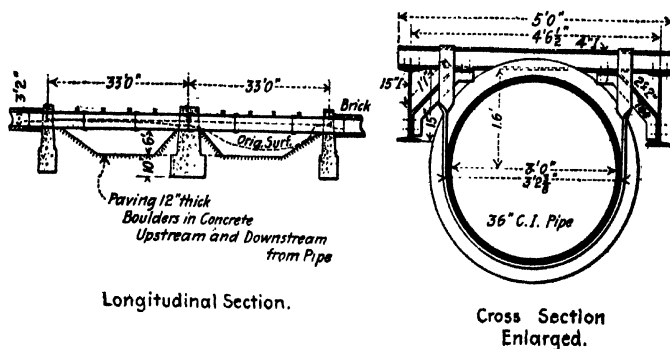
Sewer bridge, joint outlet sewer, New Jersey.
